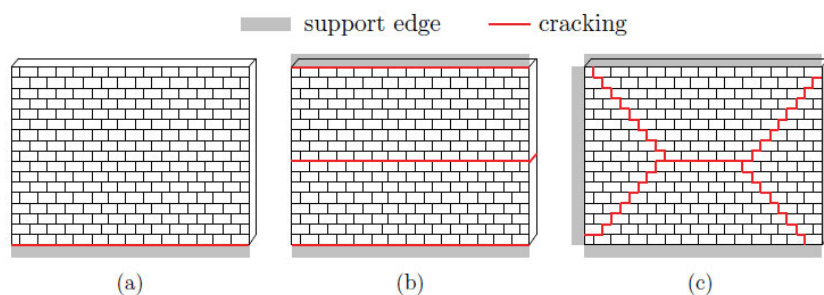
Typical out-of-plane failure cracking: (a) and (b) vertically spanning one-way walls and (c) two-way spanning walls. (Gatta, 2019)
